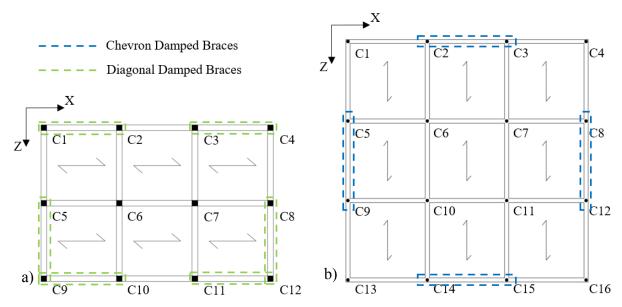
Plan layout of damped braces: (a) RC structure; (b) steel MRF.
